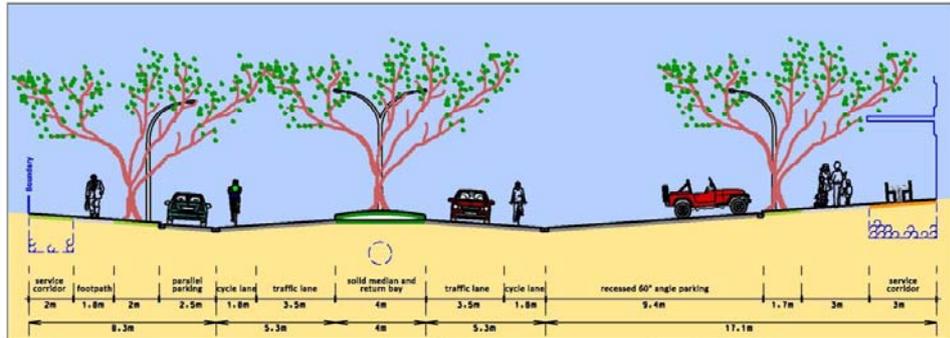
Minor Arterial Cross-Section (40 m Wide Corridor)
